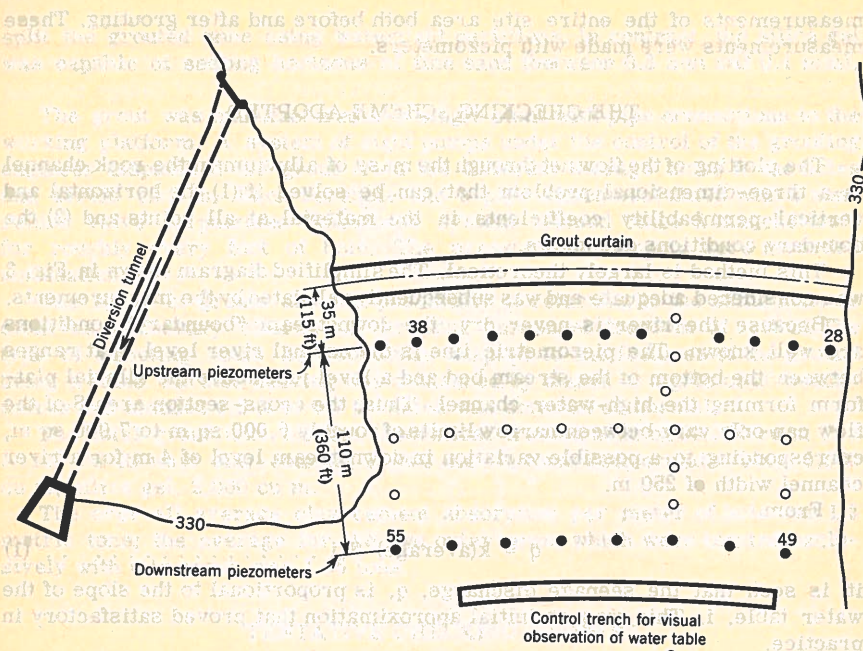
PLAN VIEW OF PIEZOMETER NETWORK
